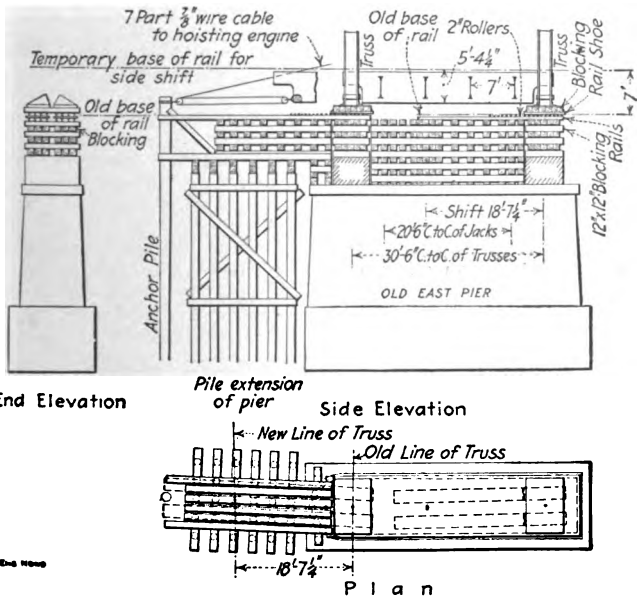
BLOCKING ON OLD EAST PIER, WITH SIDE EXTENSION OF PIER TO CARRY THE BRIDGE WHEN SHIFTED LATERALLY
